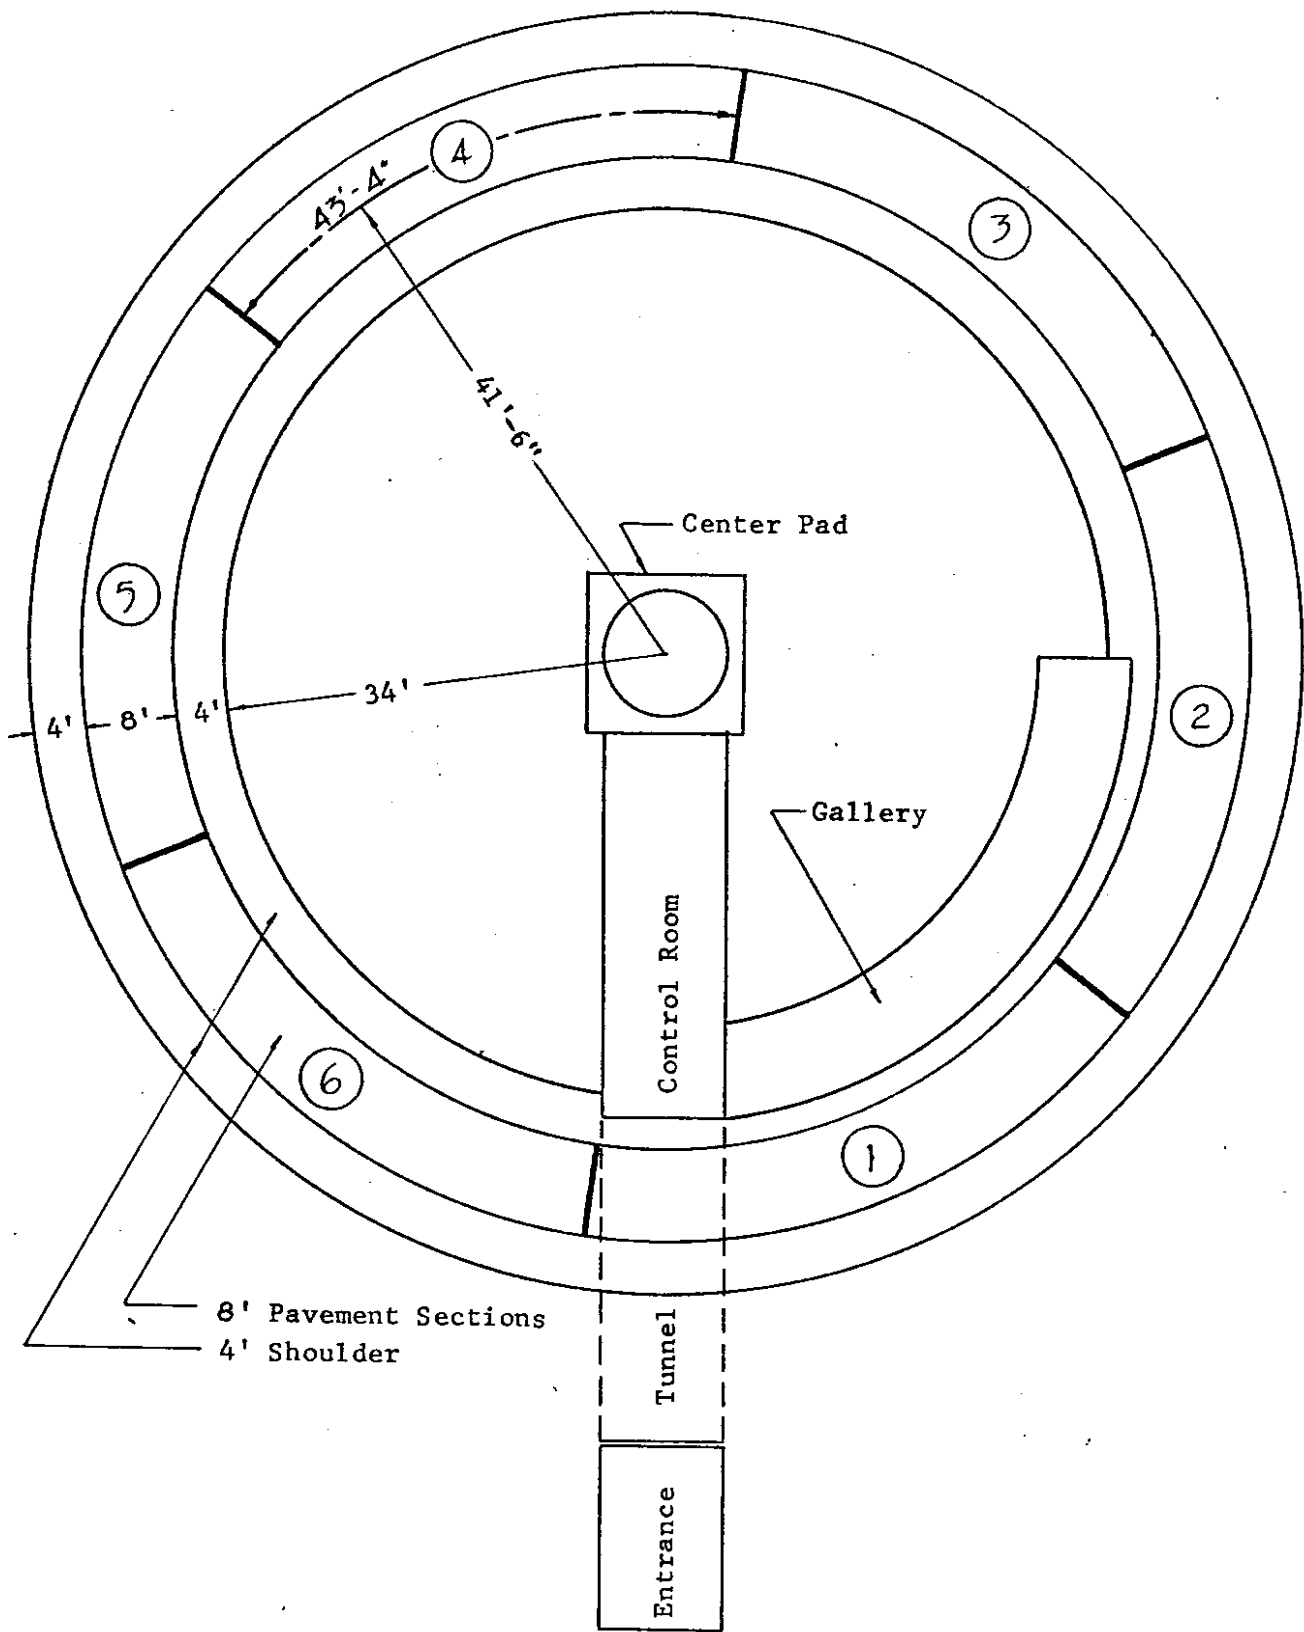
PLAN VIEW OF PERMANENT STRUCTURE AND THE PAVEMENT SECTIONS, RING 1.
